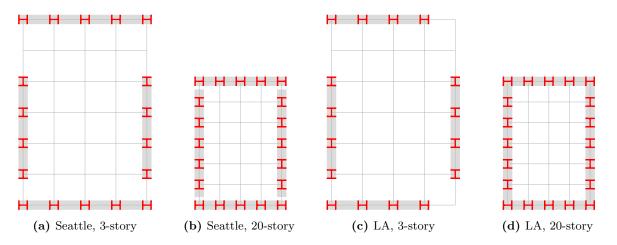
Orientation of the columns in the moment-frames for the 3- and 20-story SAC buildings. (Note that column and beam sections for each design are available in FEMA335C [4]).
